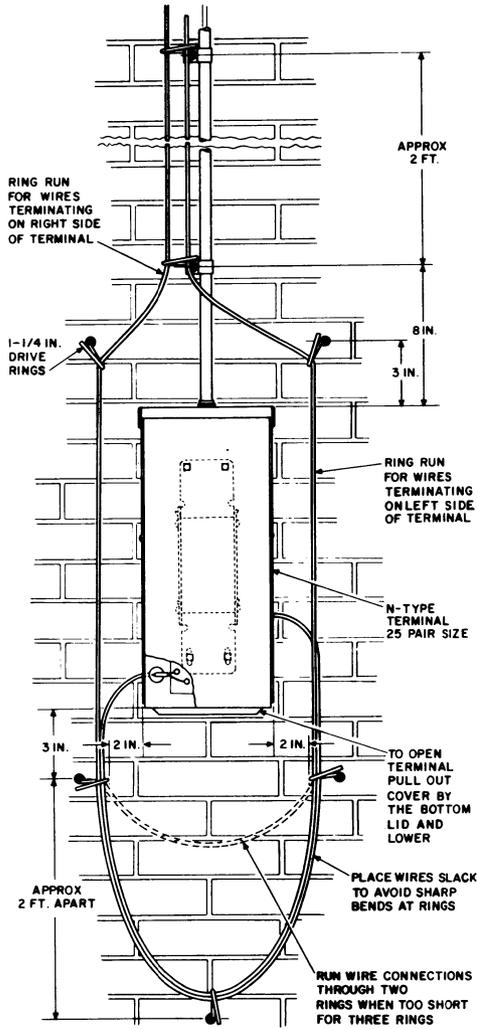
Wall-Mounted 25-Pair Cable Terminal With Stub at Top
